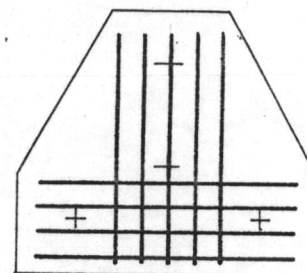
Equivalent Transformed Section of Concrete Subjected to Tension Based on Truss Analogy at Cracking and Ultimate Conditions
